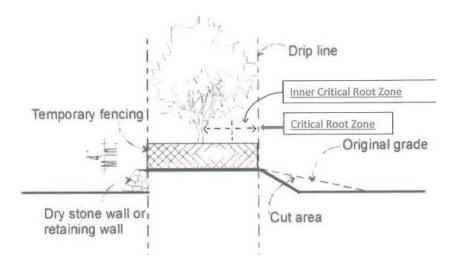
Illustration of standard techniques used to protect trees during construction.
